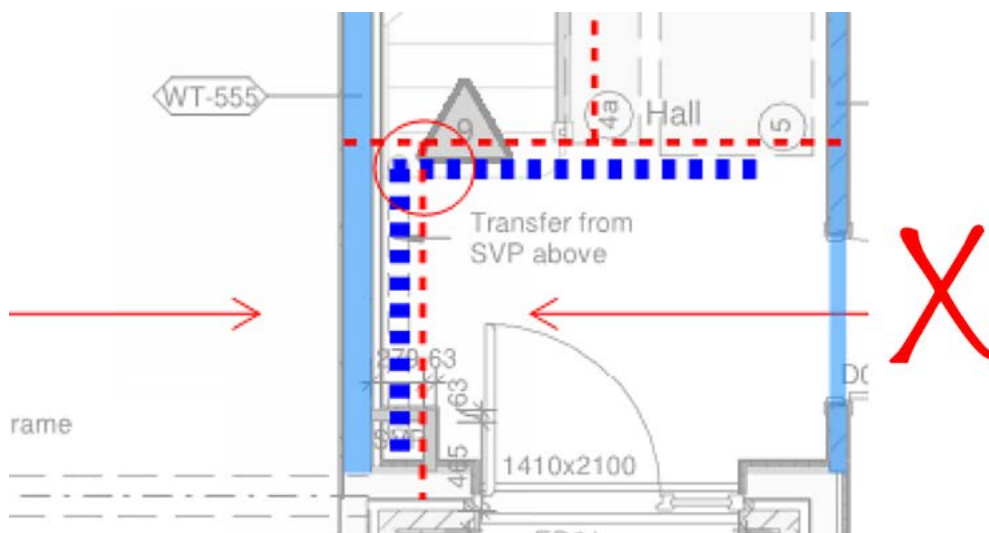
L-Shaped Drainage Run Within a Joisted Floor
